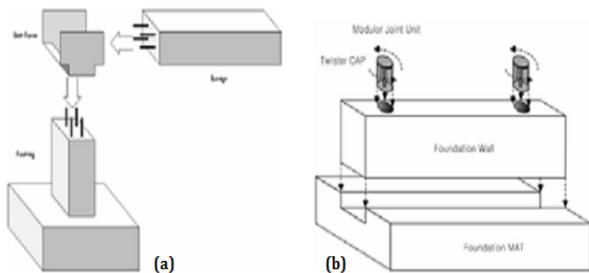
Foundation System - (a) Independent foundation. (b) Wall foundation.
